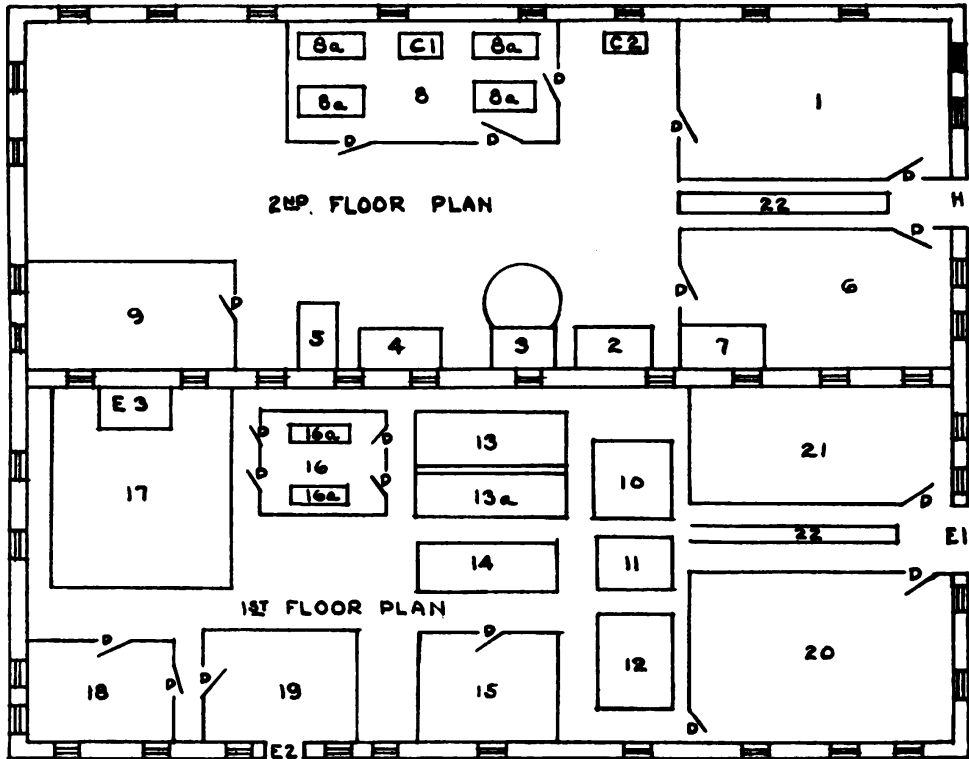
Typical lay-out plan for two-story bake shop.
